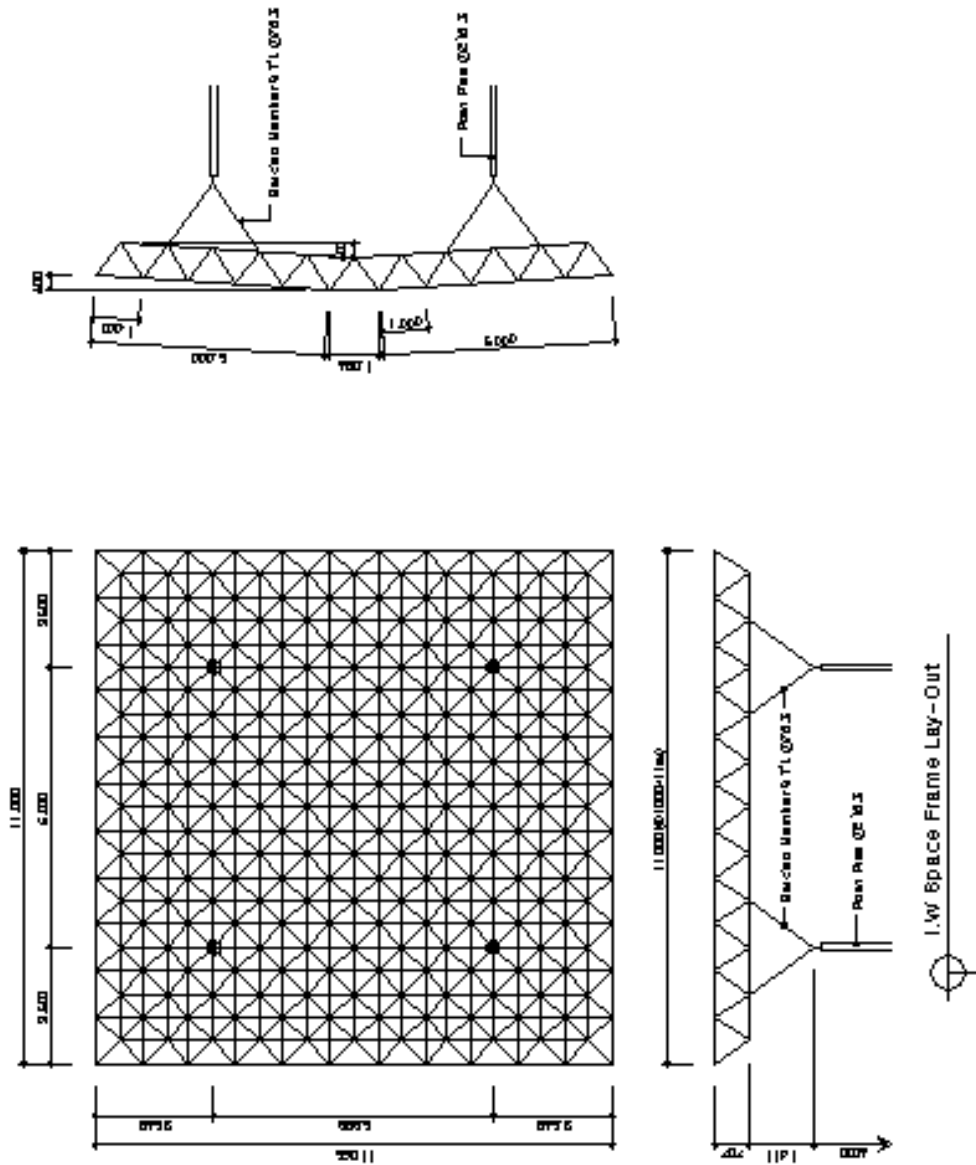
Concept of wood space truss structures constructed in Jungbu Forest Experiment Station
